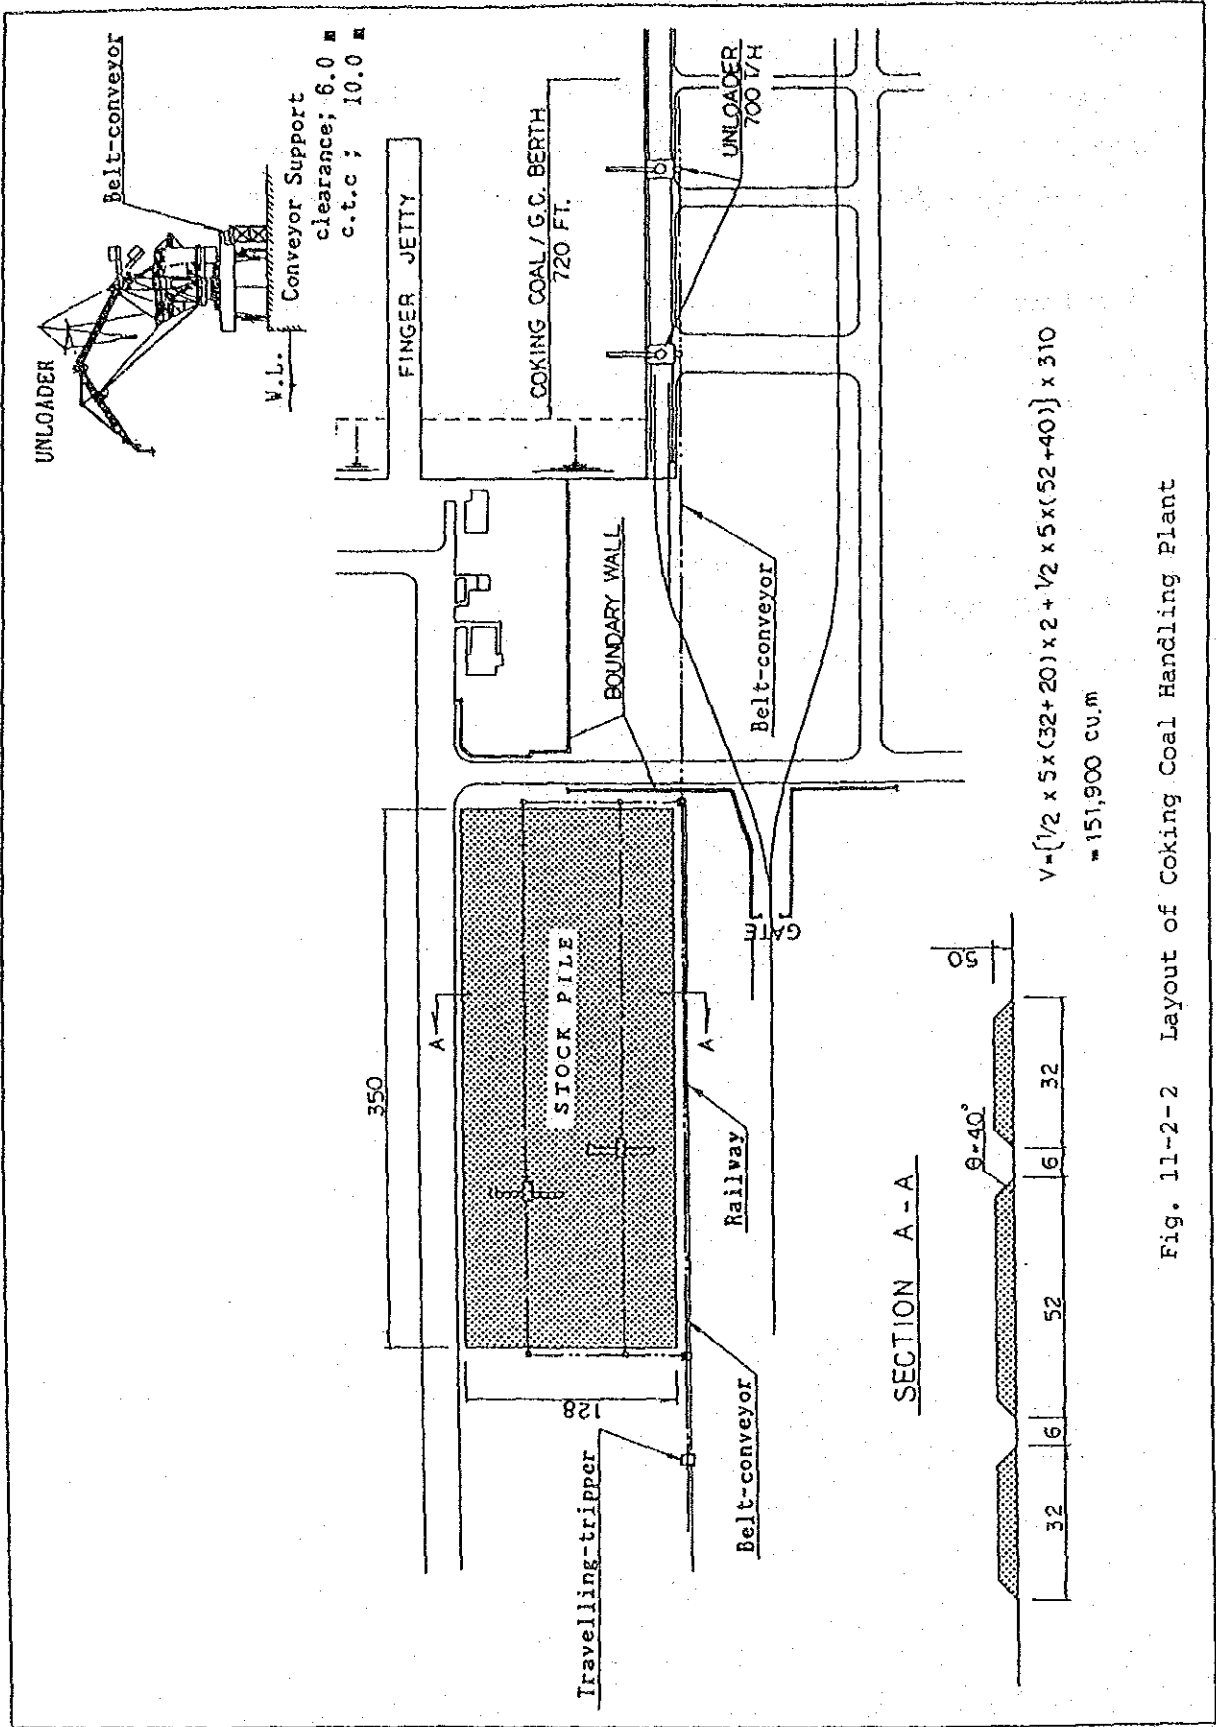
Layout of Coking Coal Handling Plant
